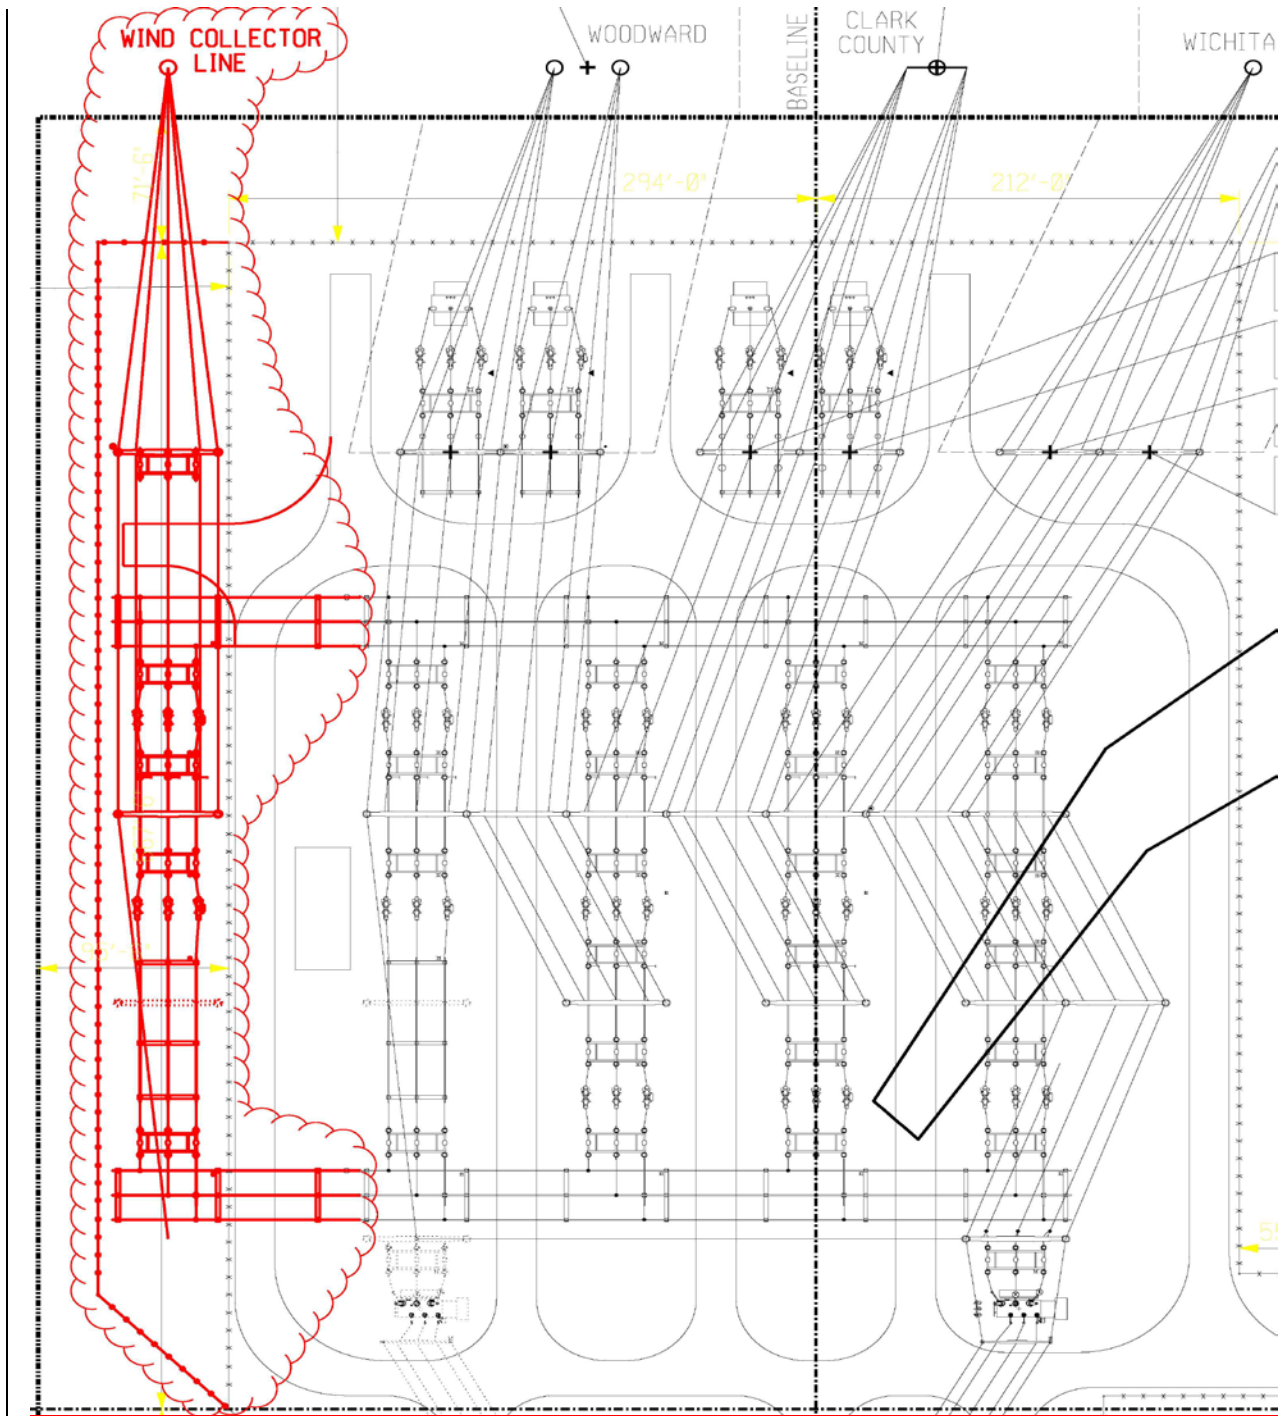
GEN-2011-043 ITCGP Thistle Interconnection substation site plan
